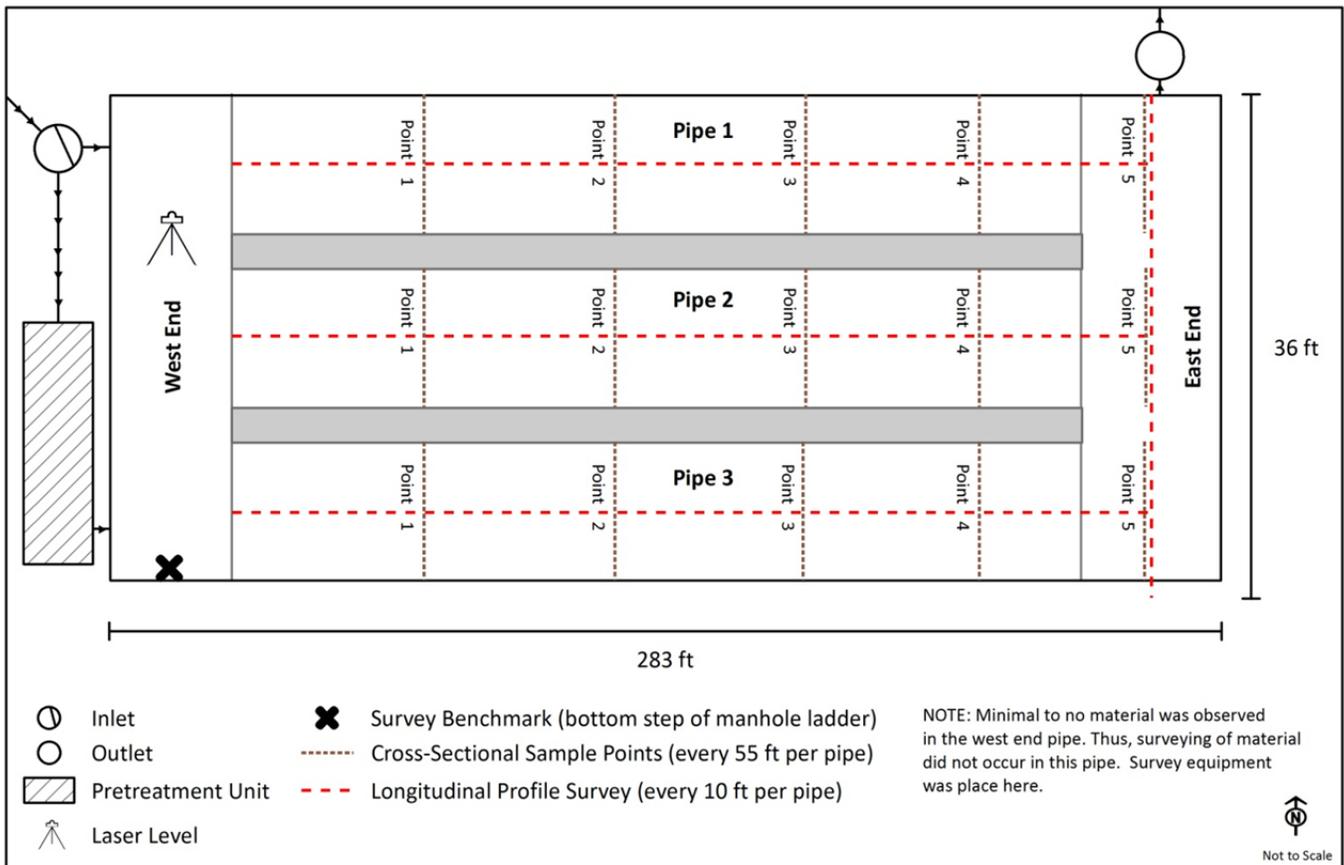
A diagram of the Arlington-Hamline Facility pipe gallery, pretreatment unit, and the inlets to the pipe gallery. Longitudinal survey stations and sampling points in each pipe are denoted.
